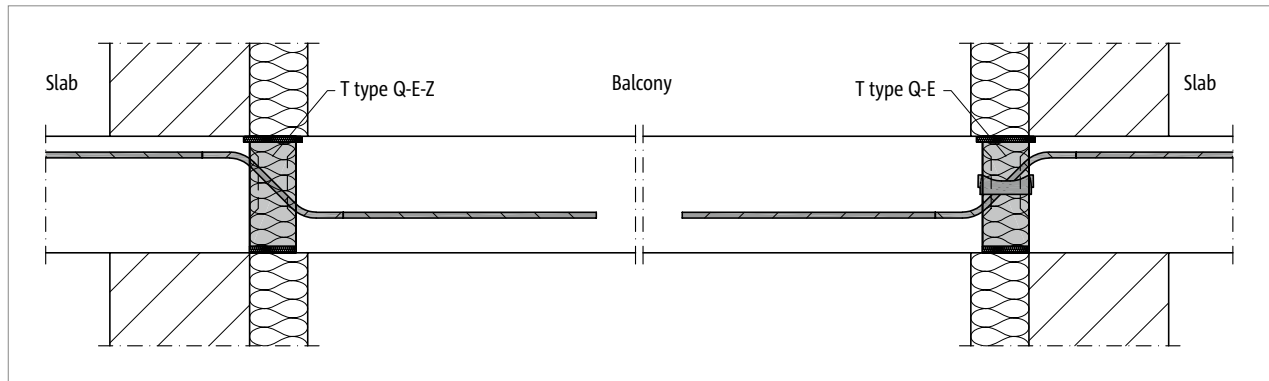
Schöck Isokorb® T type Q-E-Z, Q-E: Application case one-way reinforced concrete slab
